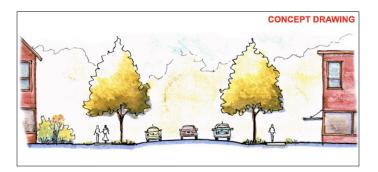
Concept drawing showing recommended sidewalk and landscape treatments
